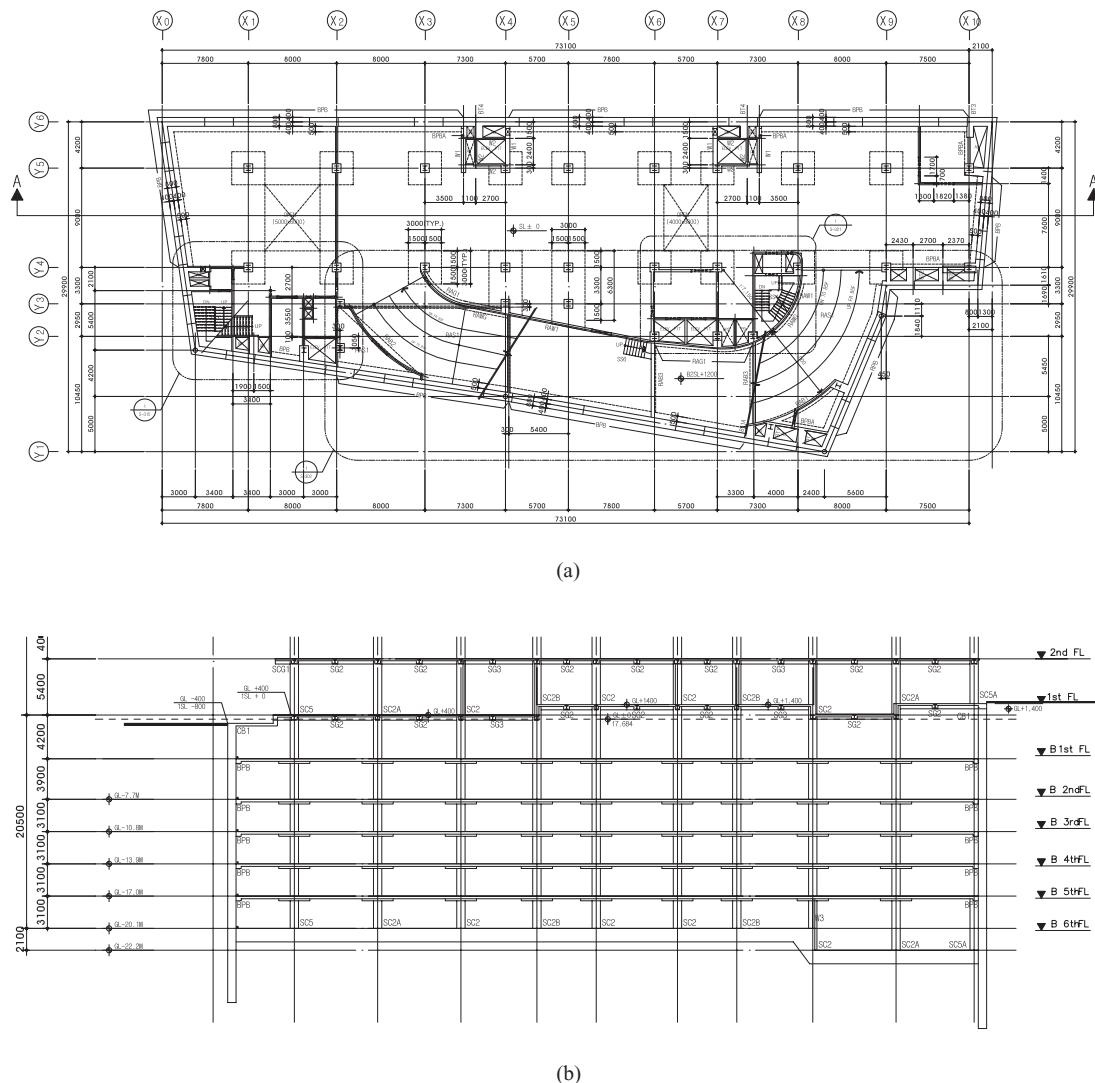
Floor plan of first floor (basement) and section. (a) Floor plan. (b) A-A section
